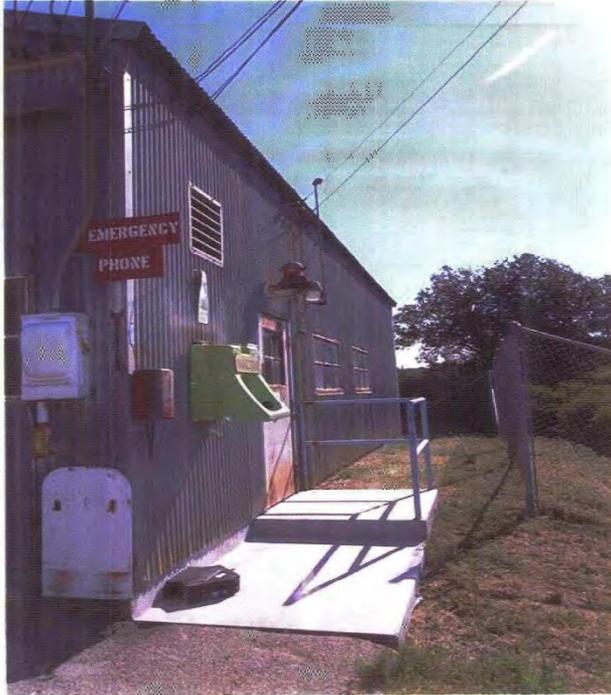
(Left): View of southern side of Building T029, looking East. Pedestrian entrance to building on south side.
